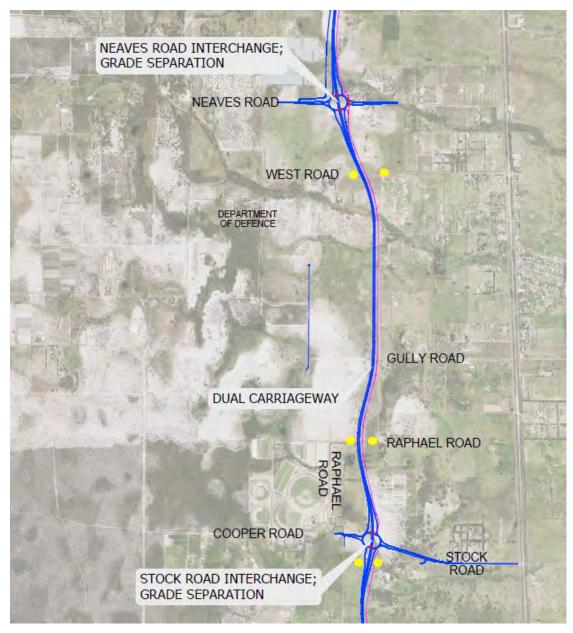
PDNH/Tonkin Highway - Stock Road to Neaves Road (MRWA)
